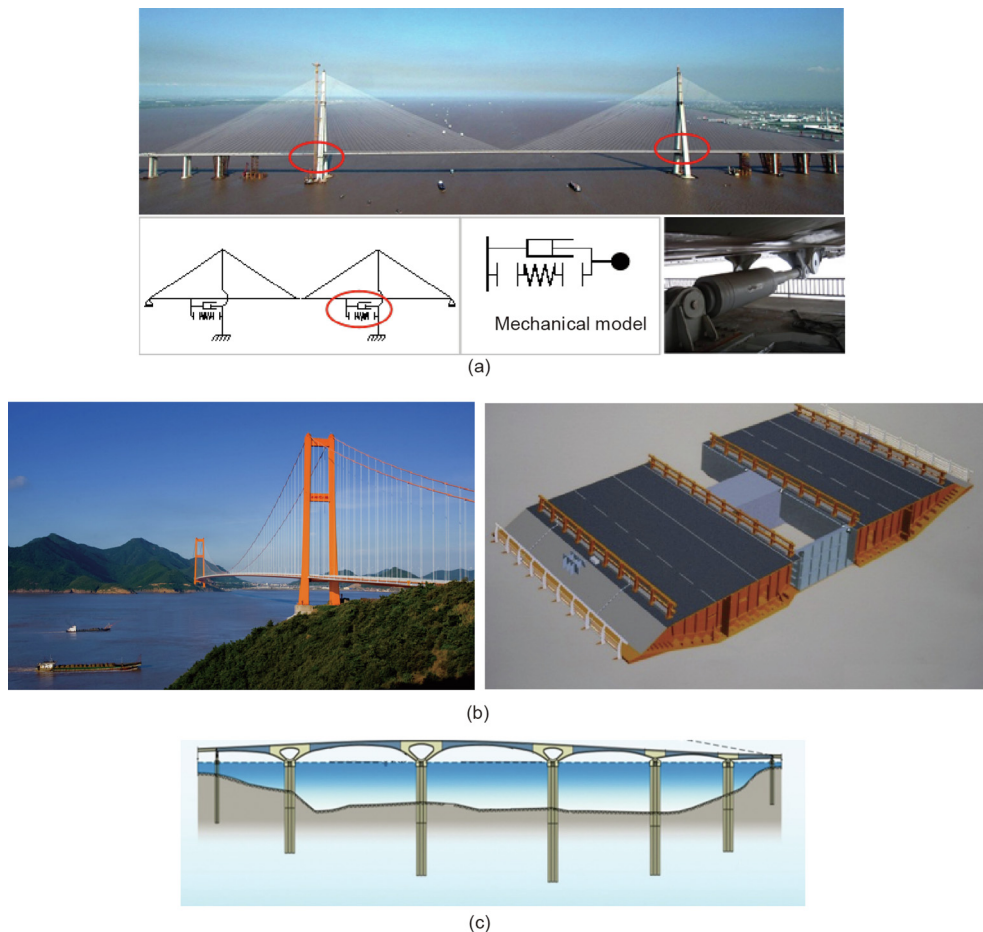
Innovative bridge types. (a) Static limited dynamic damping structure system (Su Tong Yangtze River Highway Bridge); (b) split steel box girder suspension (Xihoumen Bridge); (c) rigid-frame bridge (China–Maldives Friendship Bridge).
